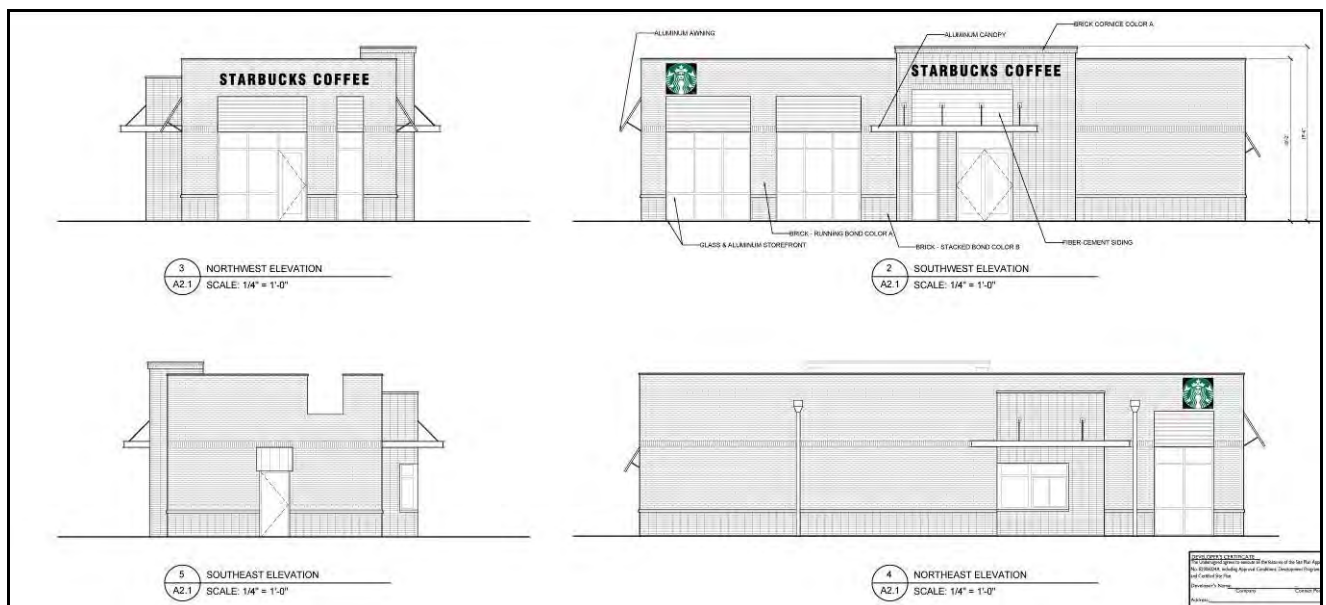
Proposed Site Plan Amendment - Architectural Elevation for Proposed Coffee Shop
